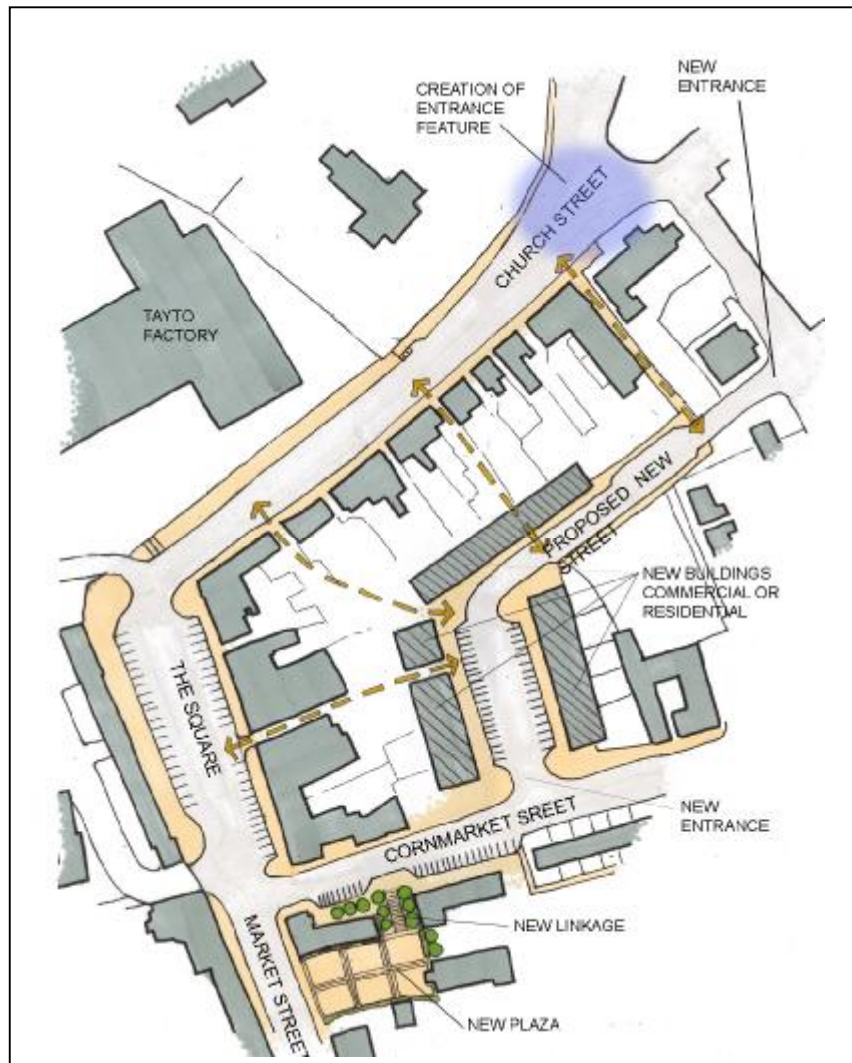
Cornmarket/ Montague Street Connection – Retail and Parking
